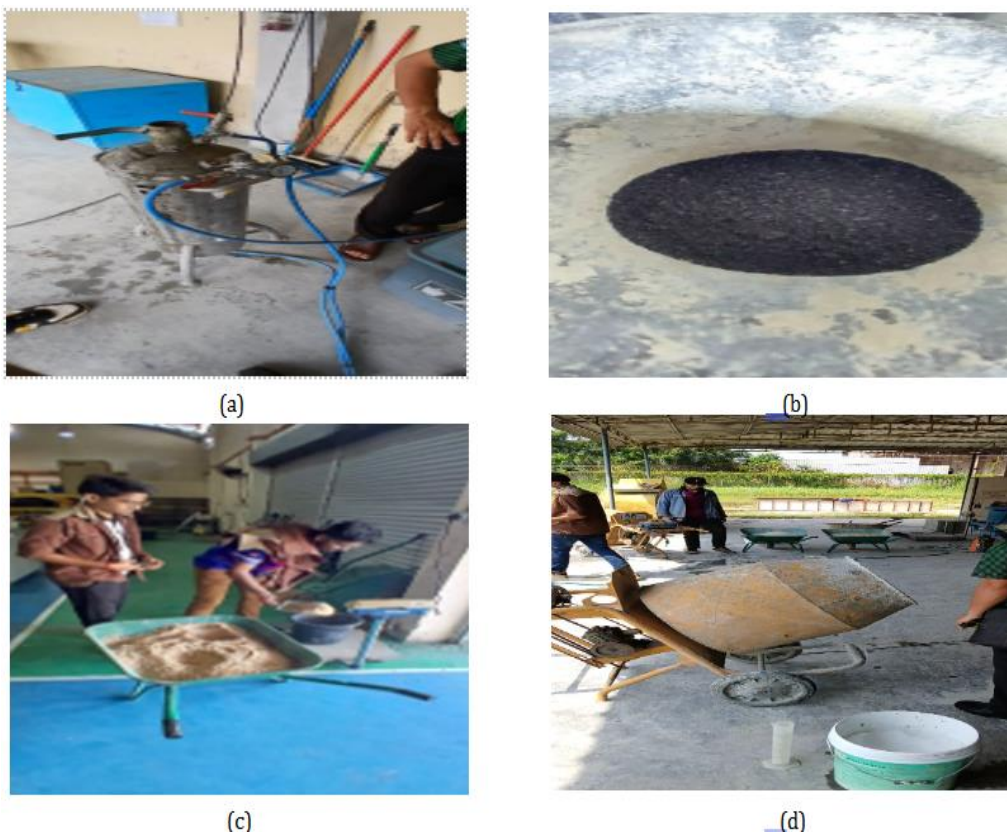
(a) Foam Concrete Machine, (b) Waste Tire Powder 1-3 mm, (c) Sand, (D) Concrete Mixer
